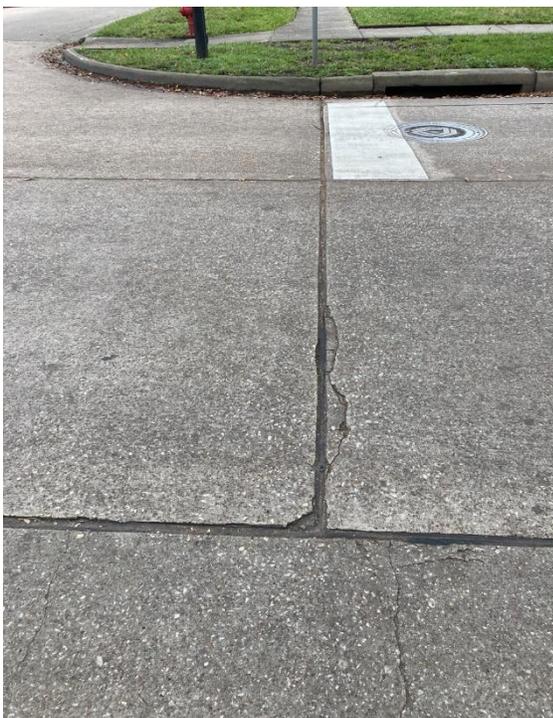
Joint spalling observed on Auden Street (Section ID: 7).
